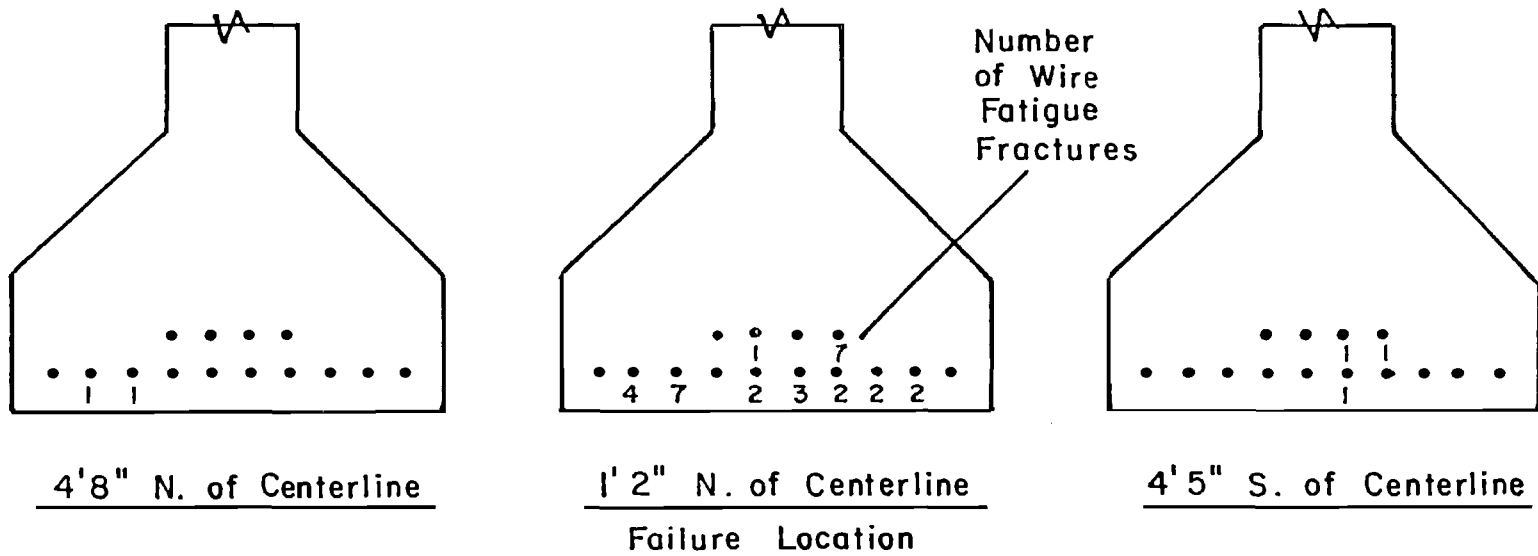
Fatigue fracture locations for Specimen C-14-NP-5.5-OL-2.29
